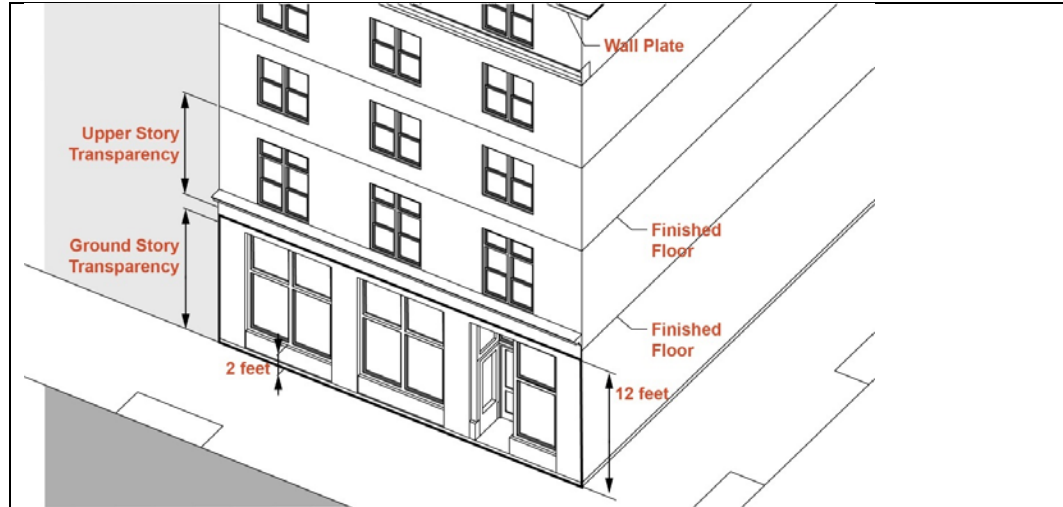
B23.10 - Ground Floor and Upper Floor Façade Glazing
